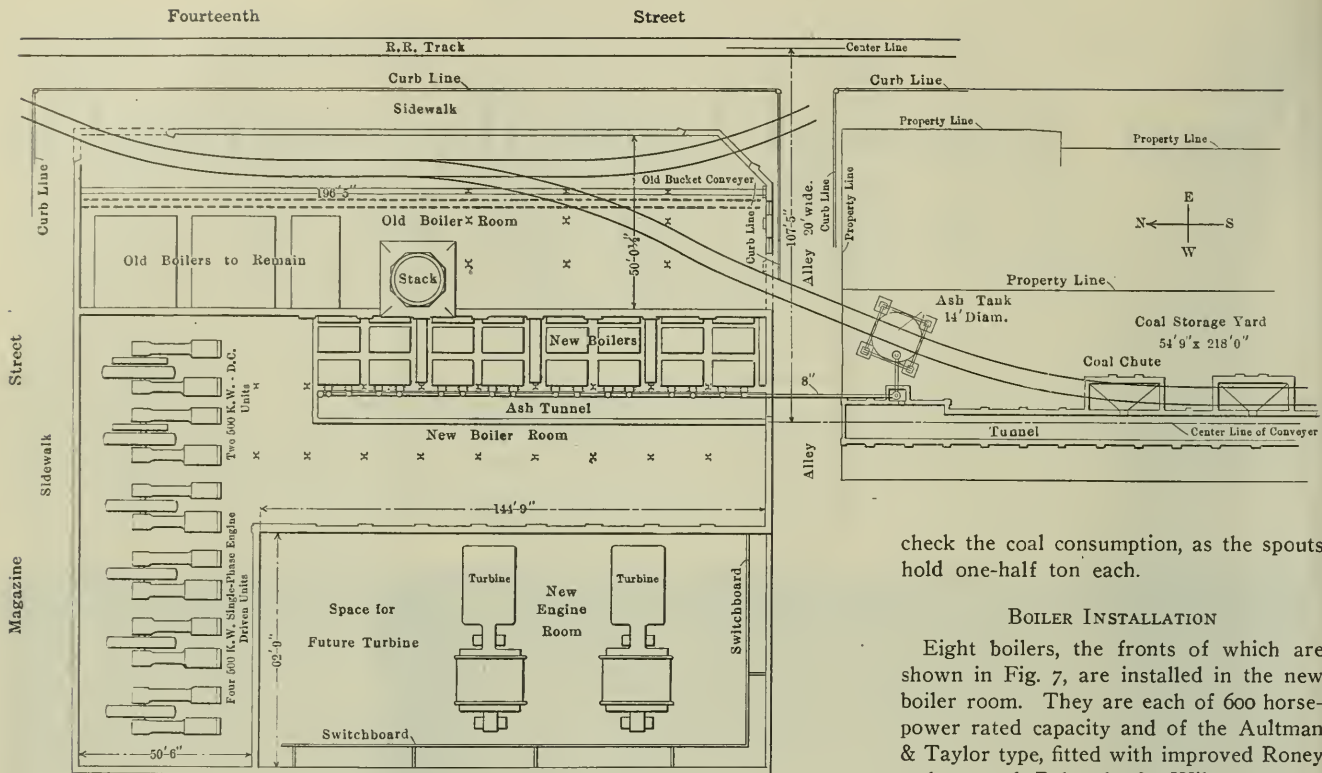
GENERAL PLAN OF YARDS AND PLANT
